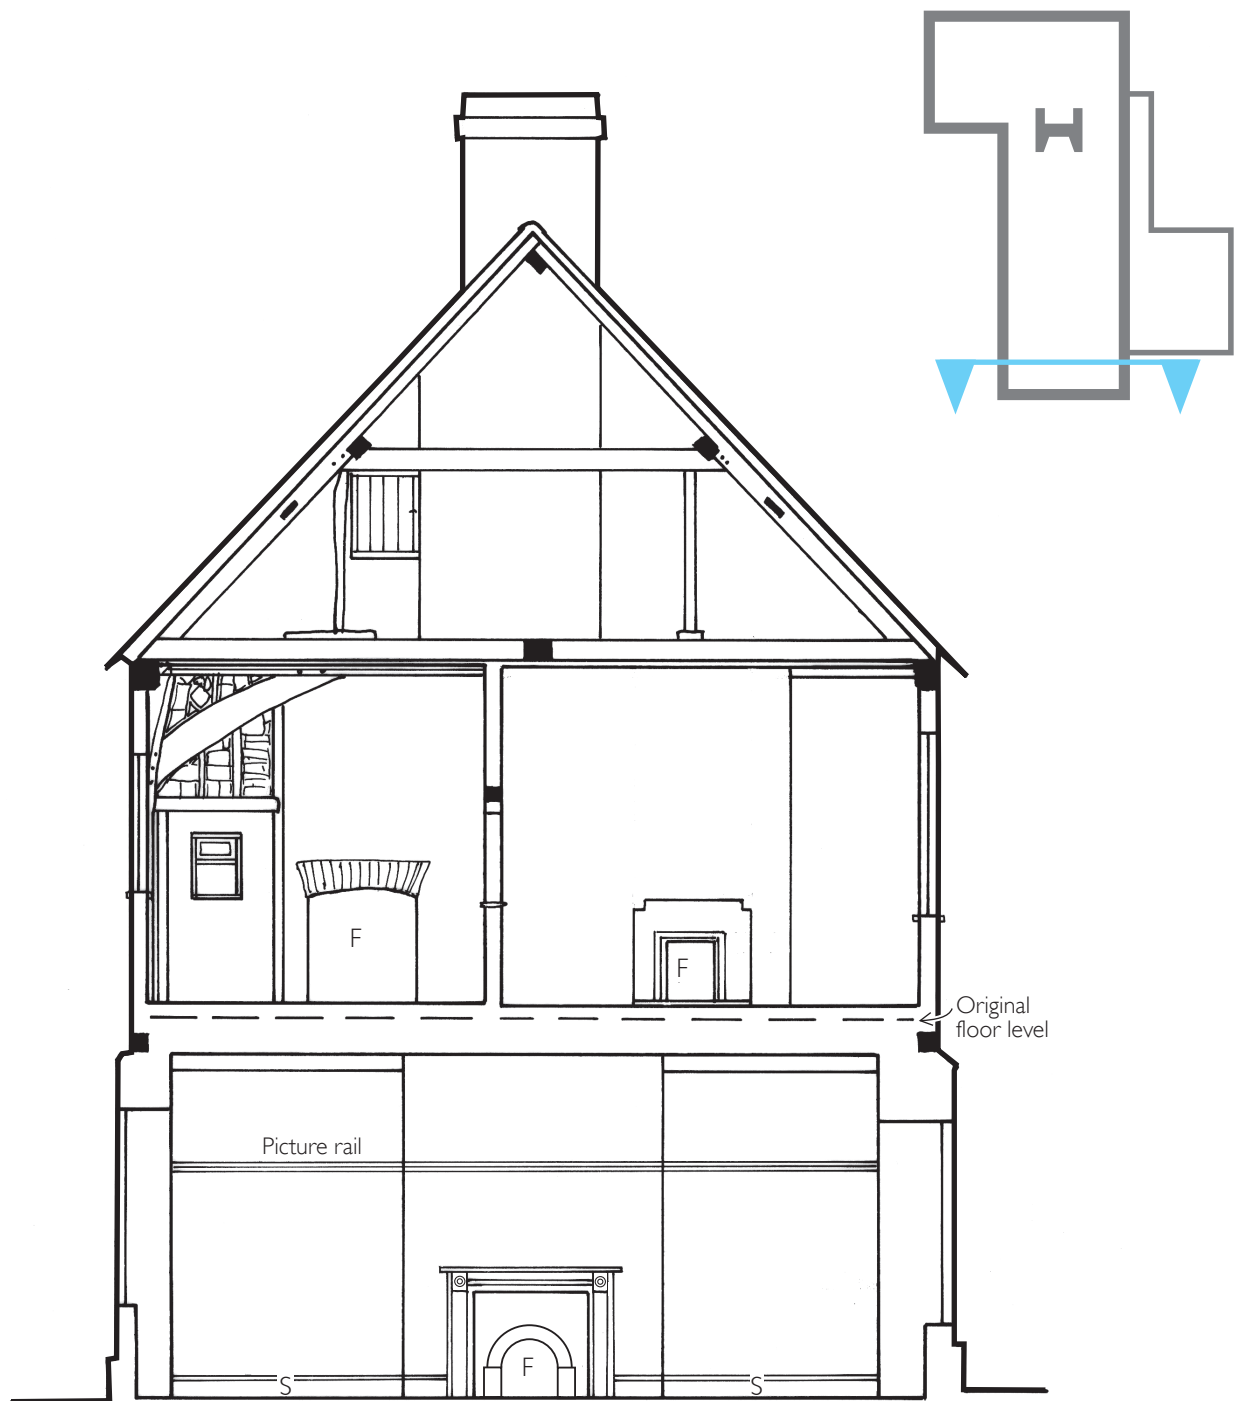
(a): Partial cross section of hall range, looking north to stack.
